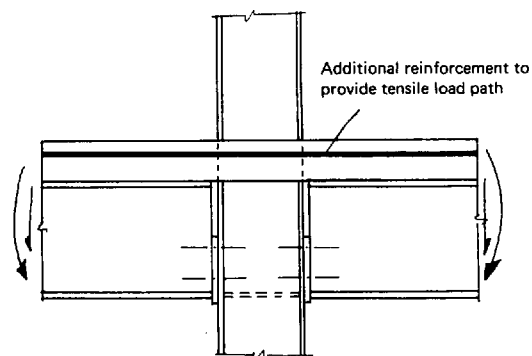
Economical semi-rigid beam-to-column connection in composite construction
